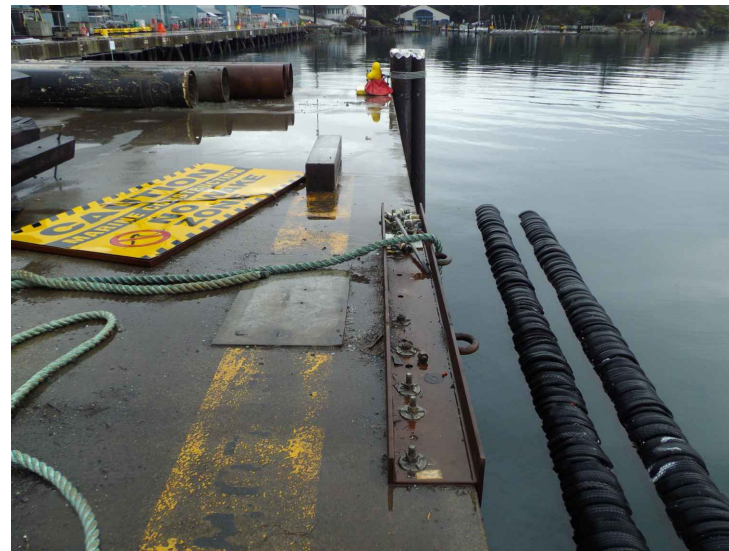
PILED DECK CRANE PAD SOUTH FACE - NOTE CORNER DOLPHIN AND STEEL BRACKET
